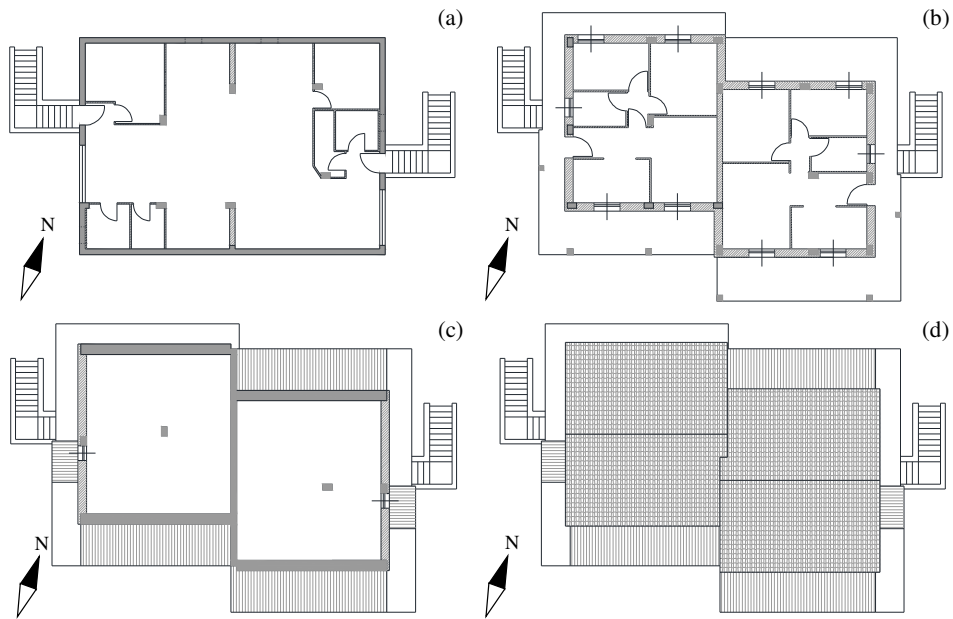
Architectural plans: (a) underground floor, (b) ground floor, (c) attic floor, (d) roof.
